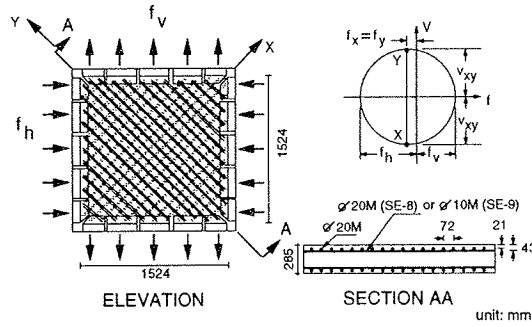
Reinforcement layout and application of stresses of SE-8 and SE-9
